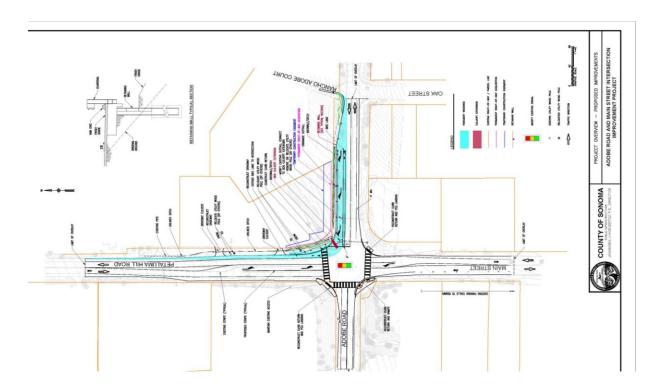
A Long-Term Improvement Plan (County General Plan)
